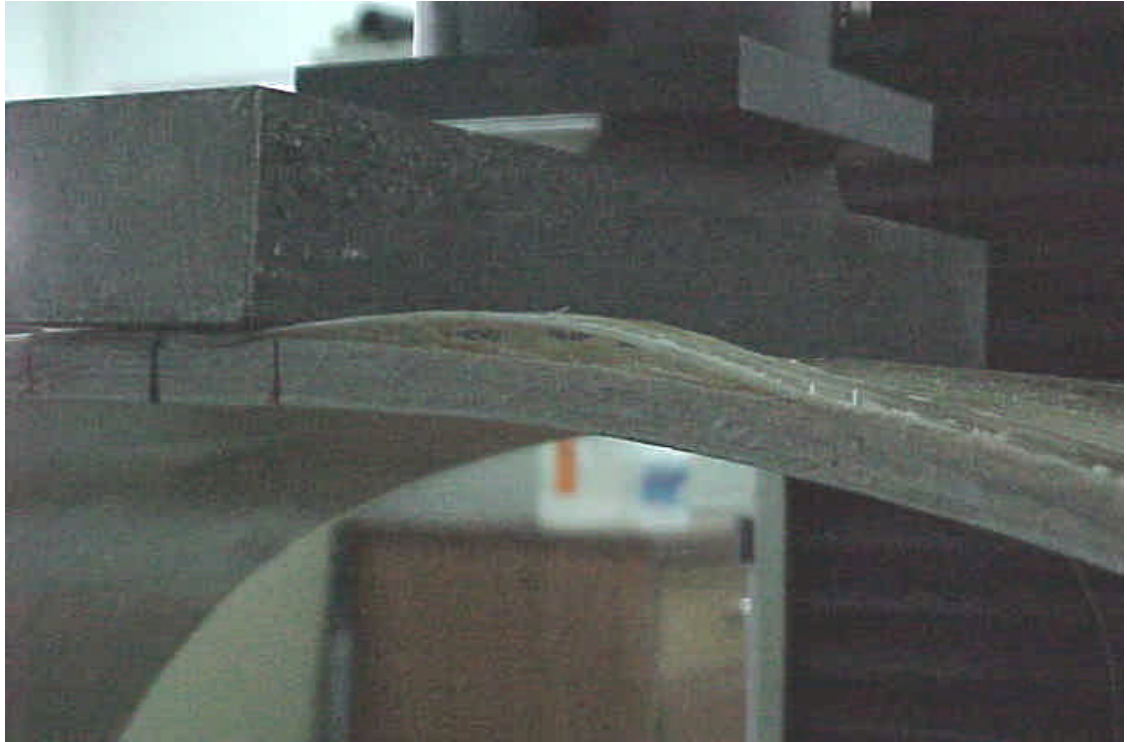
Test piece 2. Buckling of pipe wall around upper bar
